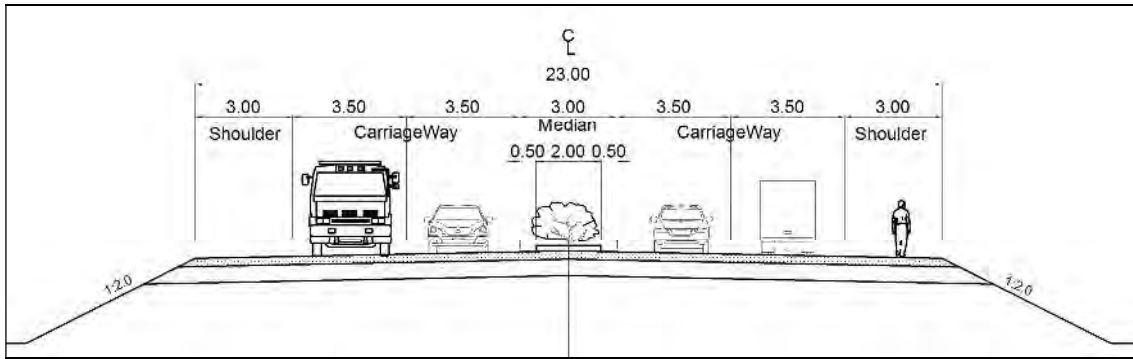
Typical Cross Section of Embankment of RR3
